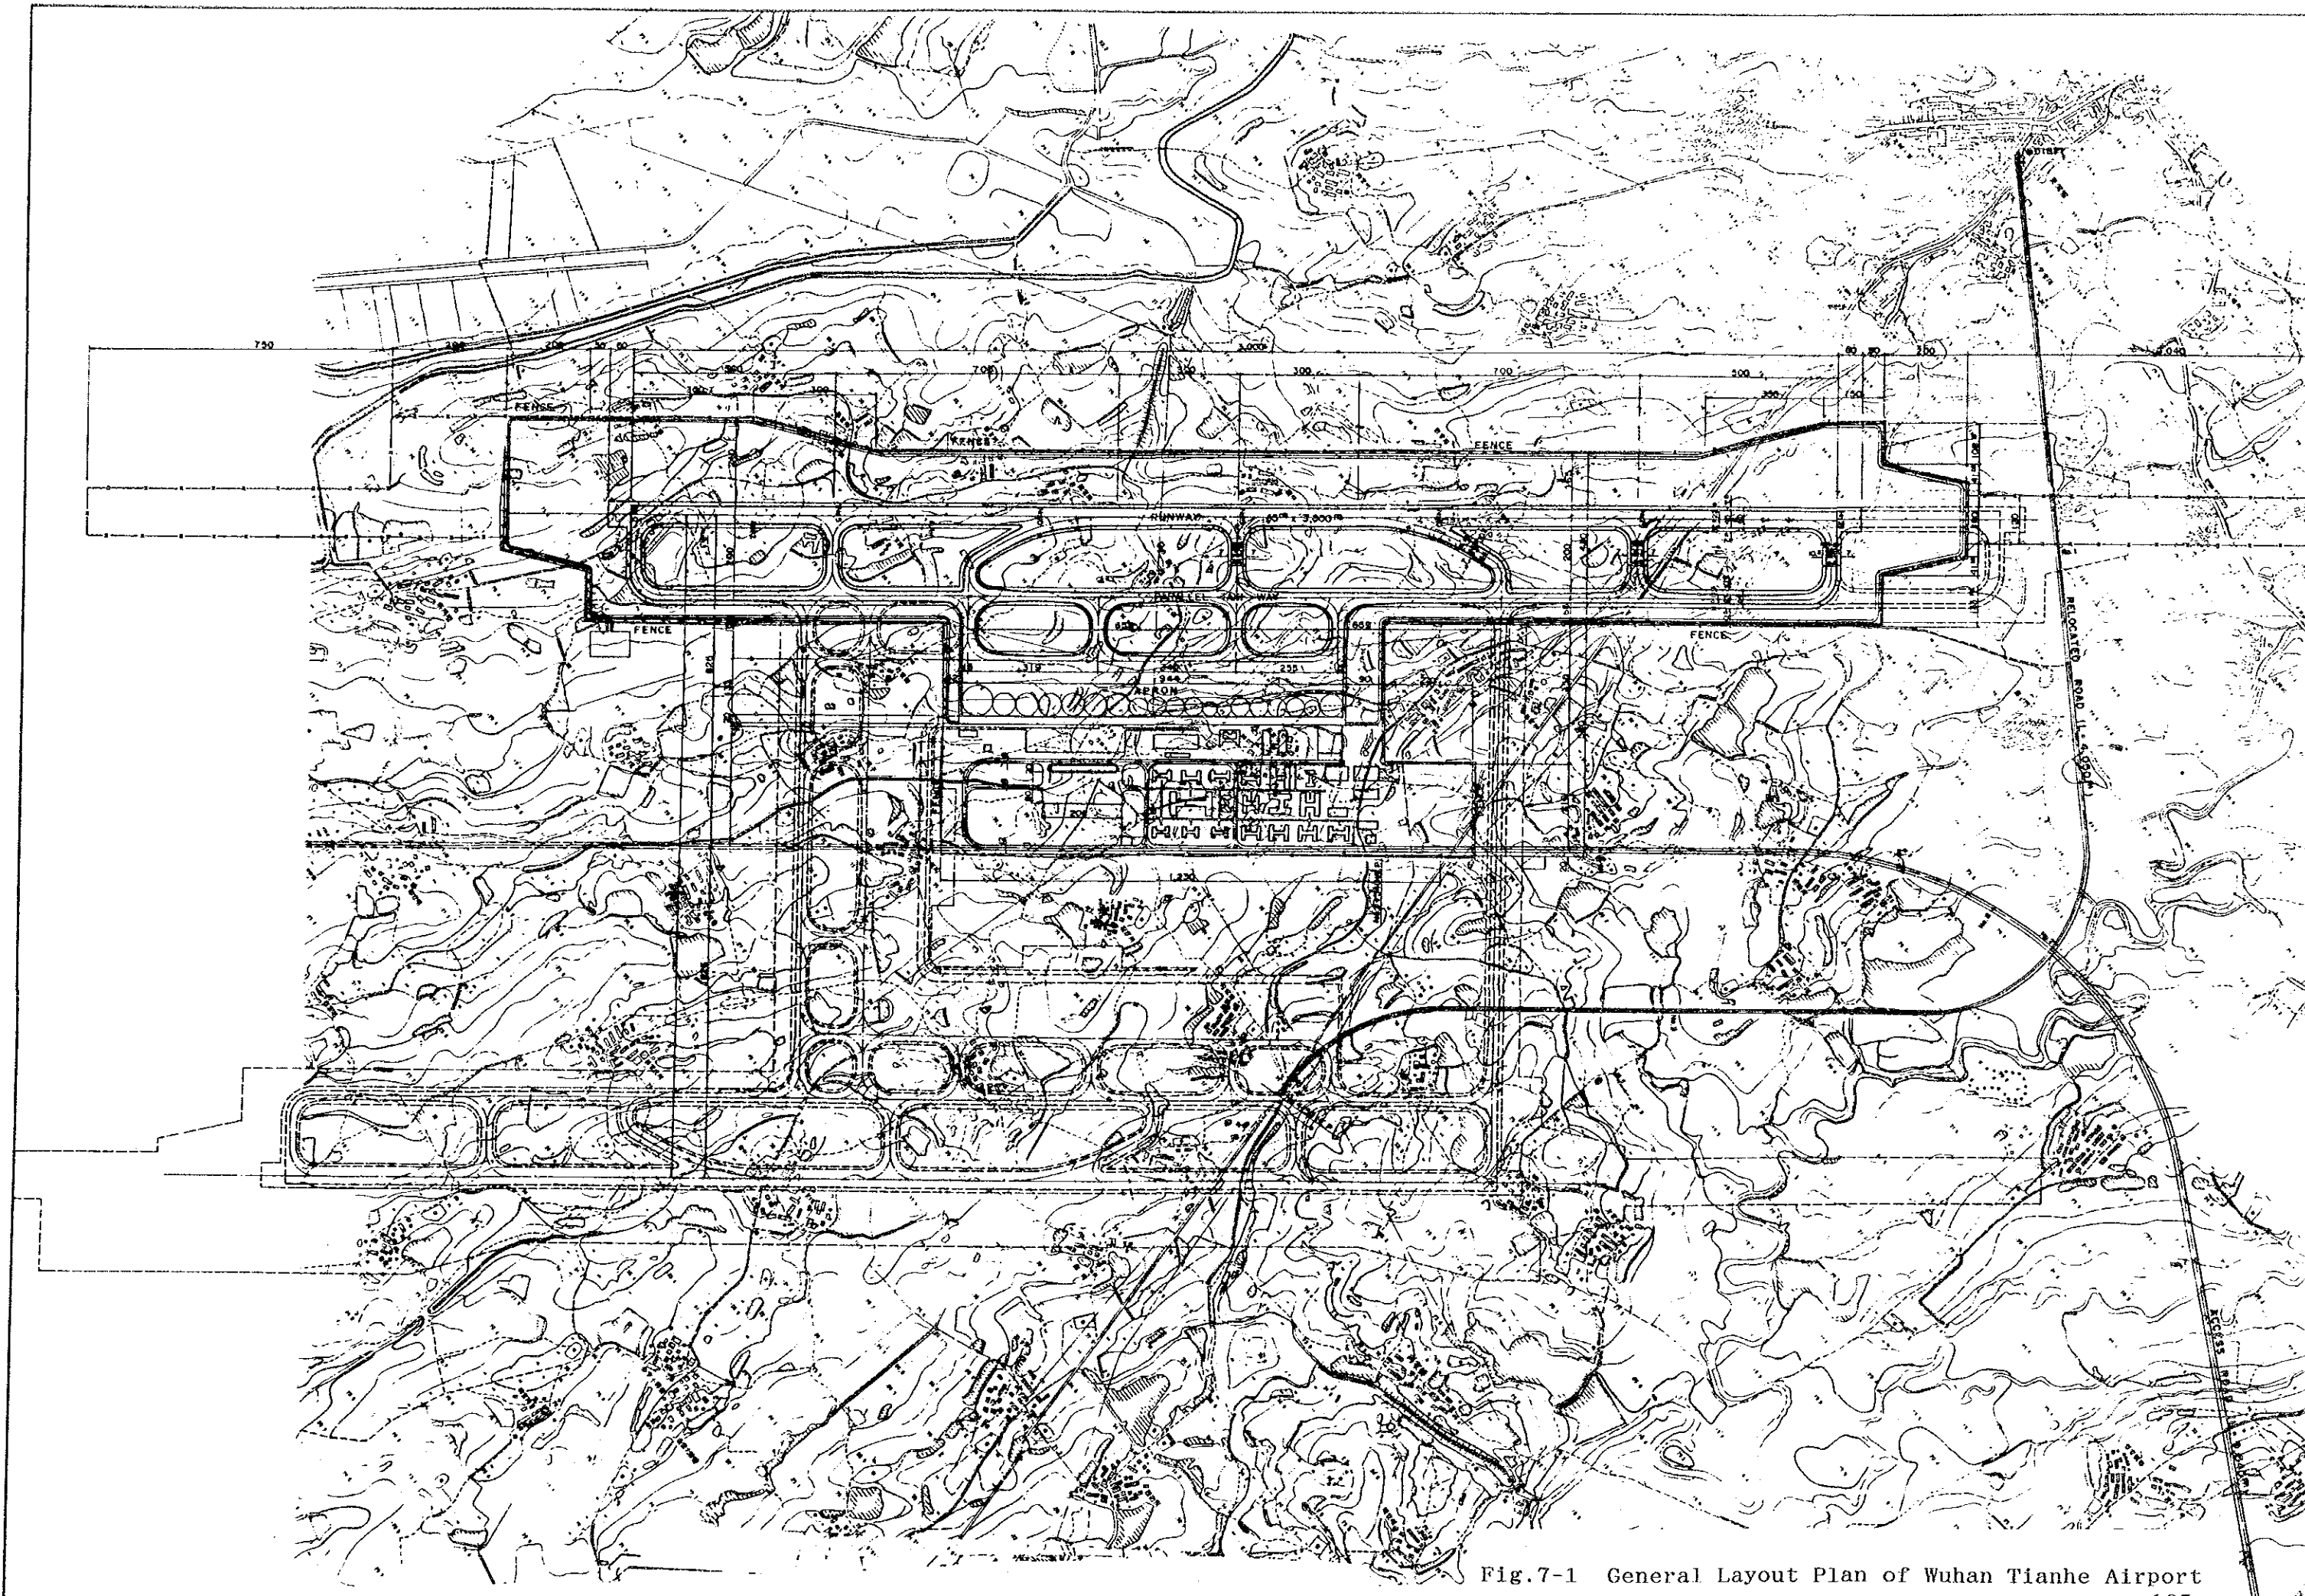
General Layout Plan of Wuhan Tianhe Airport
